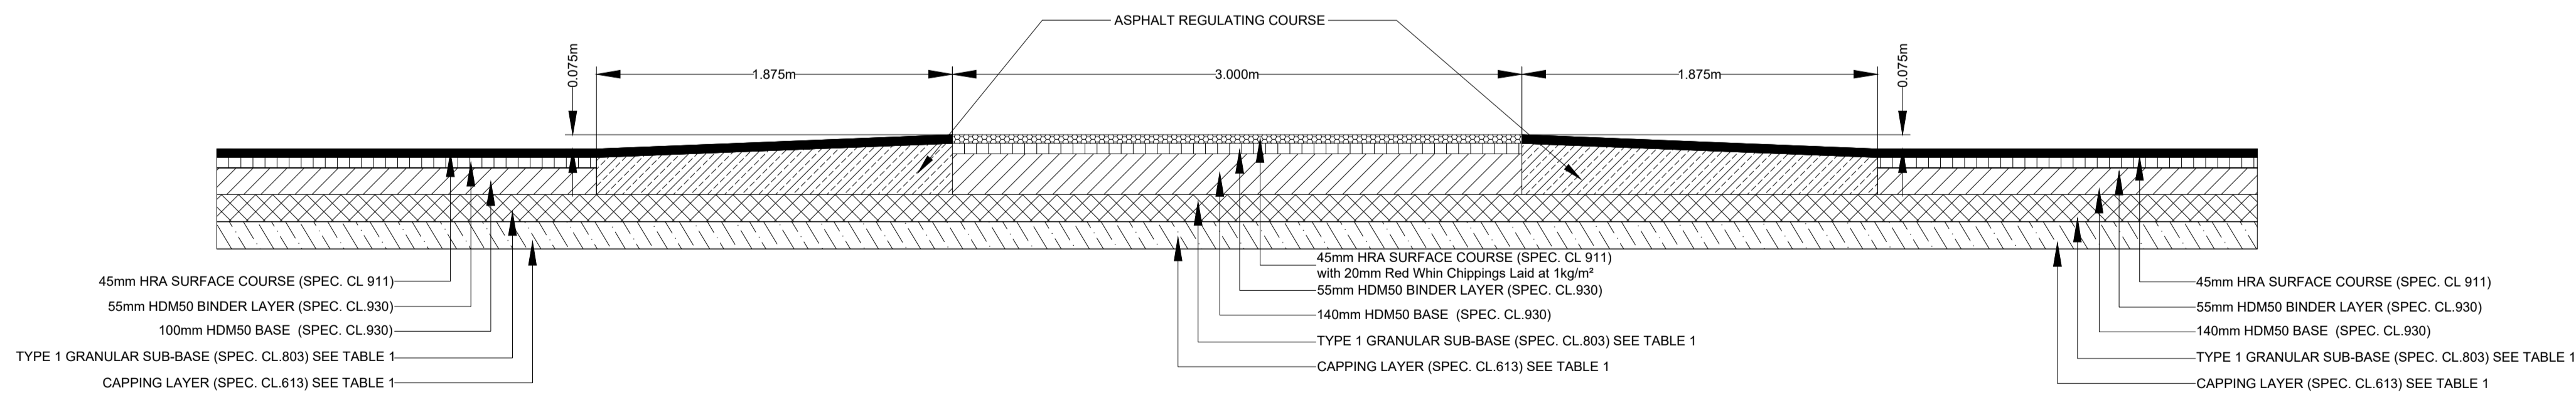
ROAD D CONSTRUCTION DETAILS (1:20)
